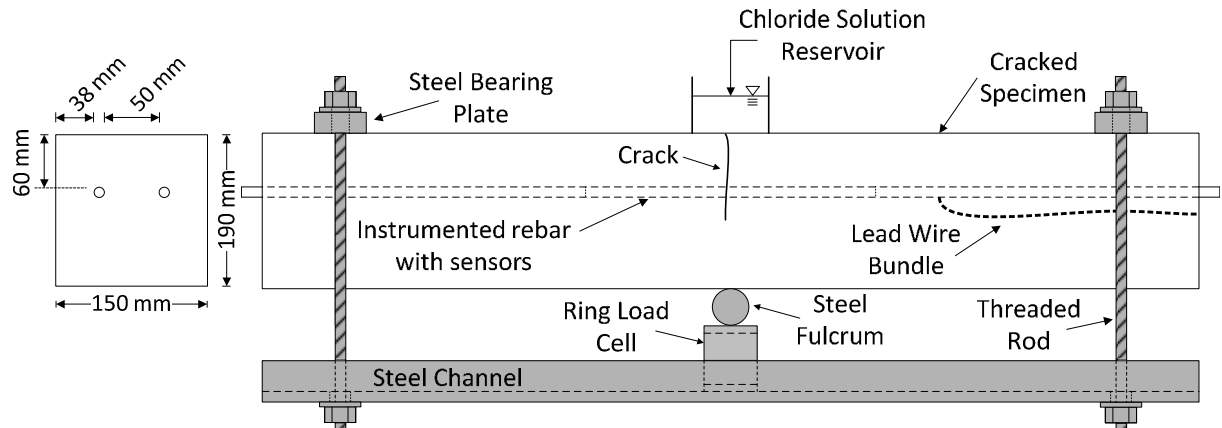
Steel cracking frames for loading of beams with specimen illustrating the instrumented rebar and ponding reservoir, after [Pease et al., 2011].
